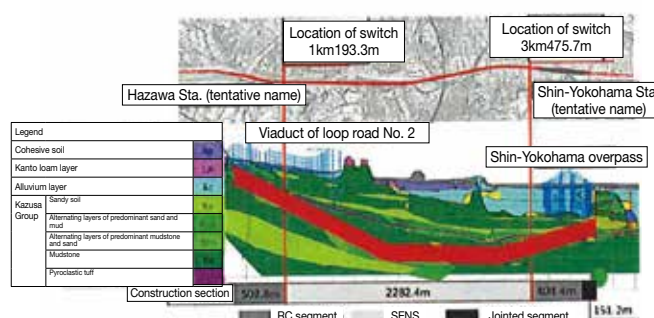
Longitudinal geology profile of Hazawa Tunnel
